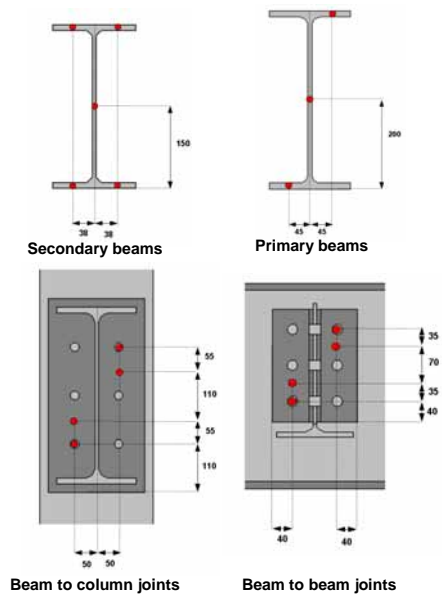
Location of thermocouples on each instrumented steelwork cross section
